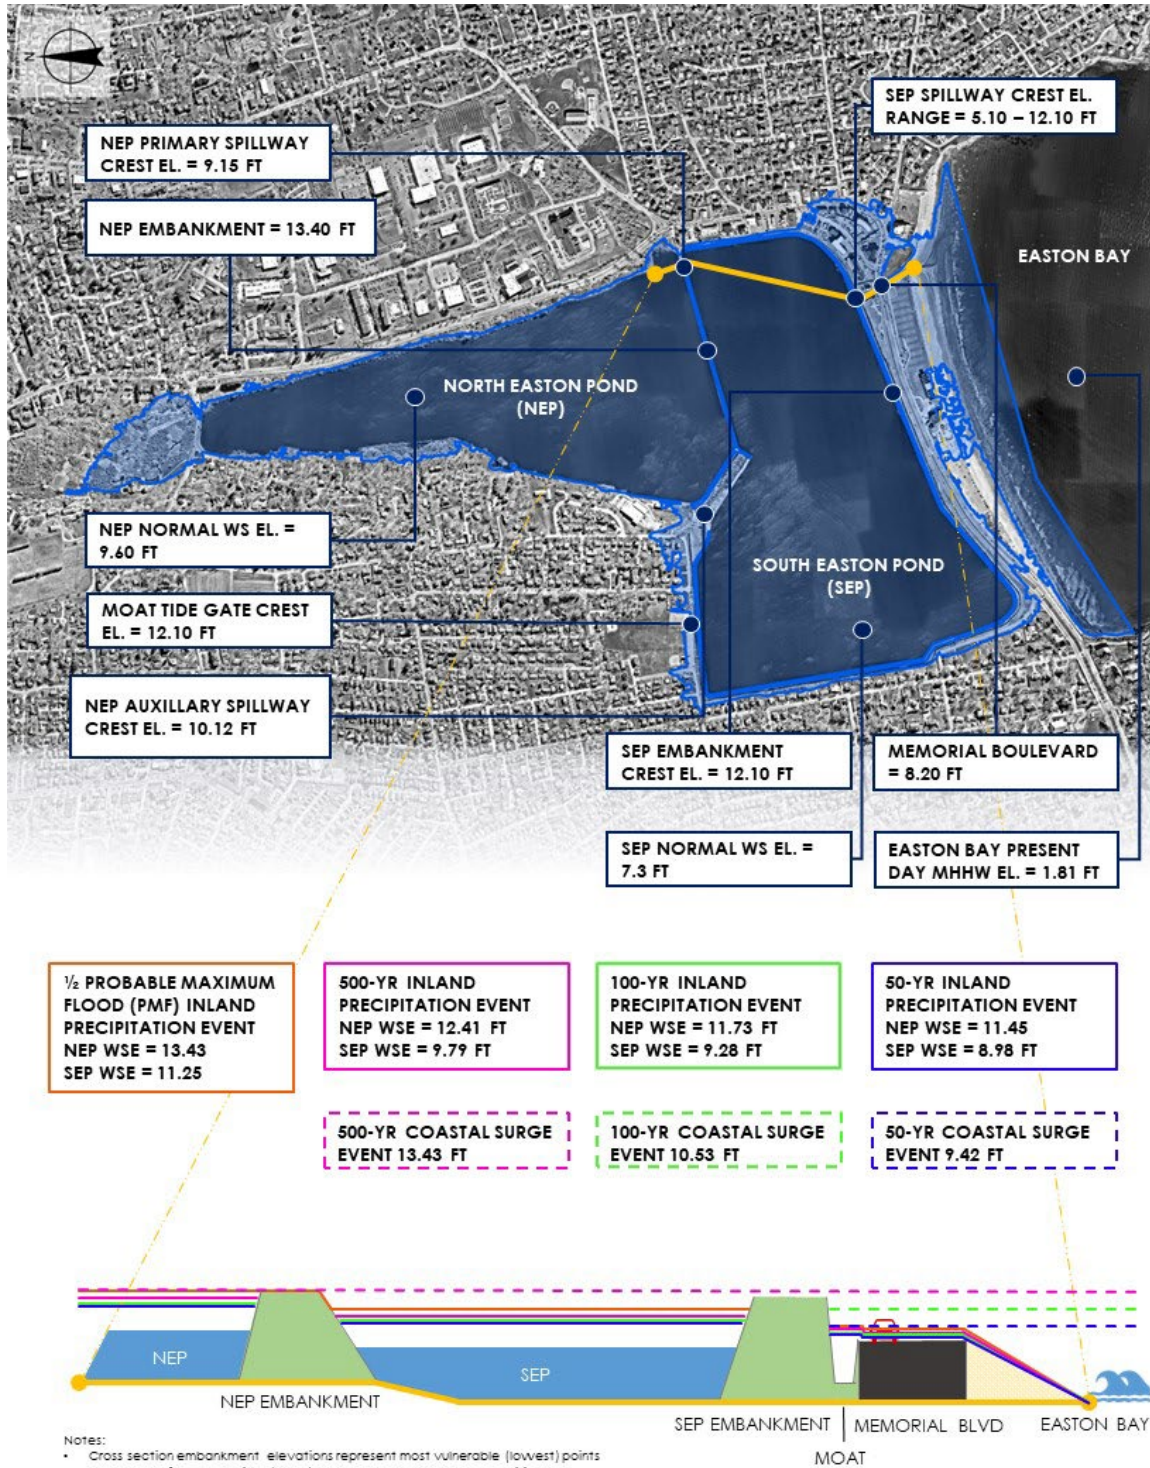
Peak Water Surface Elevation Plan & Profile View for Recommended Alternative (Present-Day)
